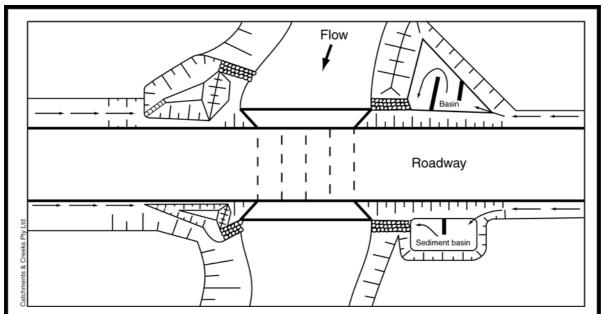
Example of major sediment traps constructed at the four corners of the road and stream junction
